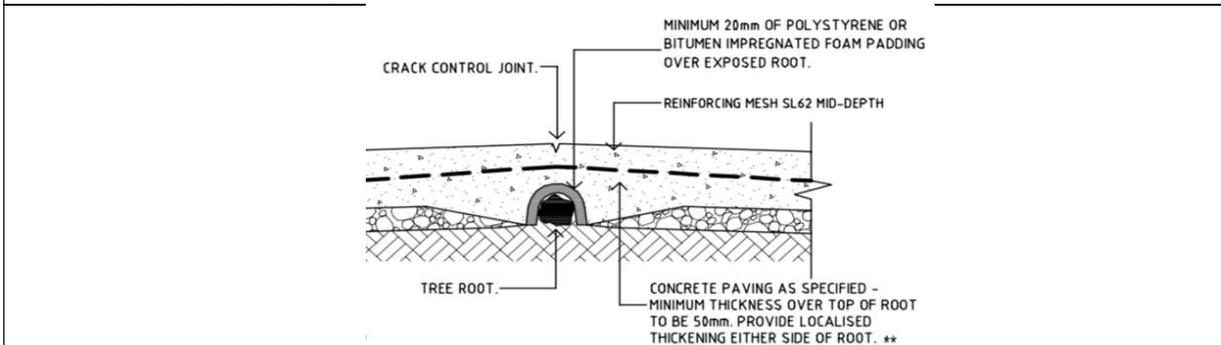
Image D: Example method for bridging concrete surfacing over tree roots provided in the Canterbury Bankstown Council standard drawings.⁶
